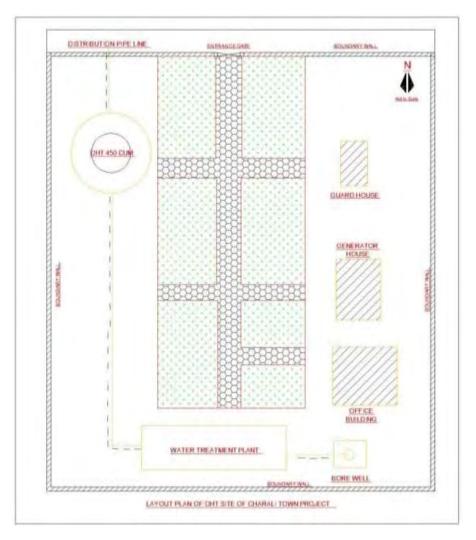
Layout of the Water Treatment Plant, OHT and Buildings in Charali
